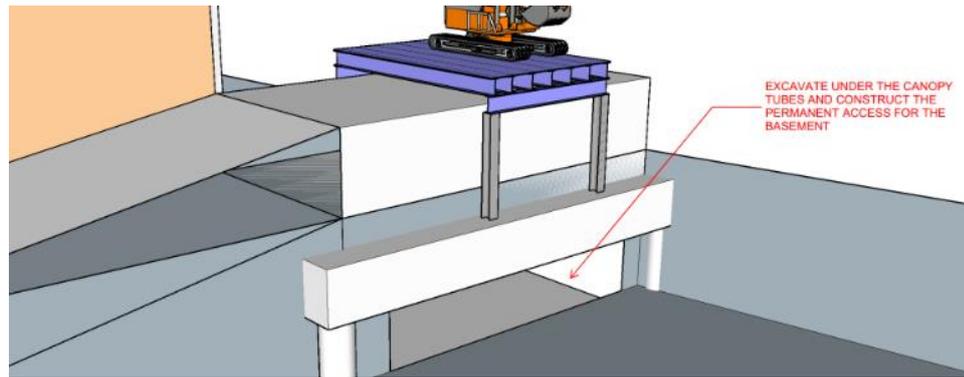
Excavation to connect basements after canopy piling tube capping beam has been poured
